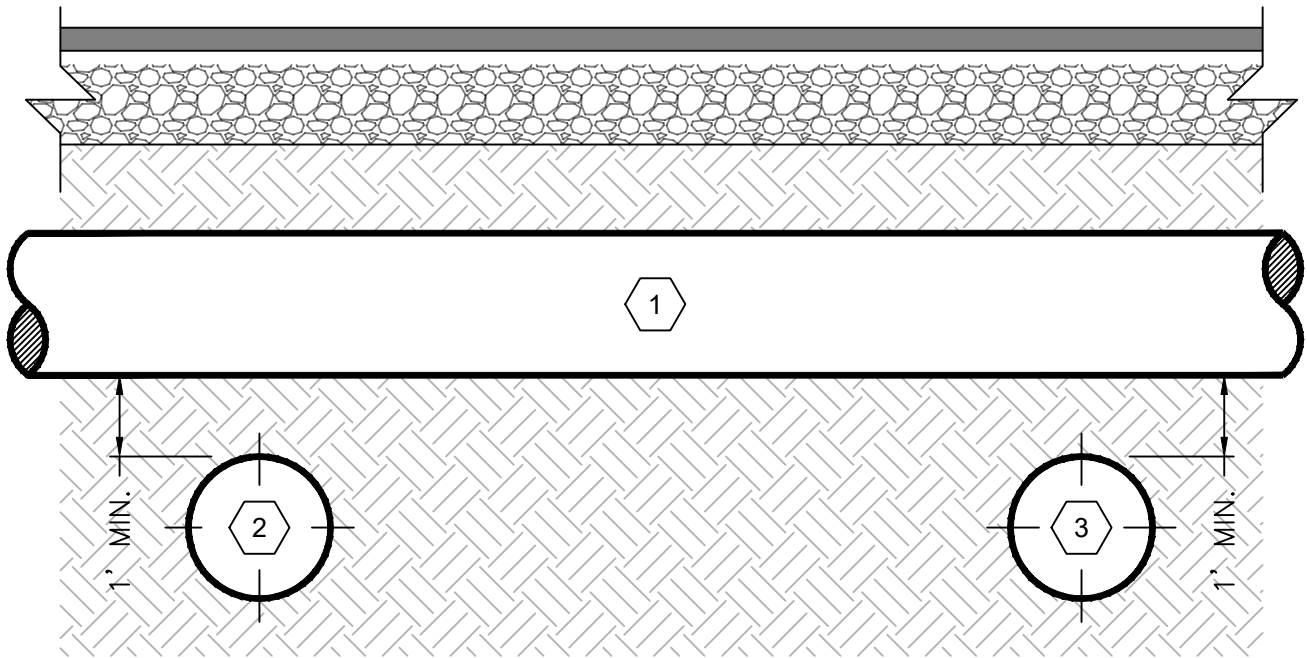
MINIMUM SEPARATION STANDARDS FOR CROSSINGS OF NEW WATER PIPES
